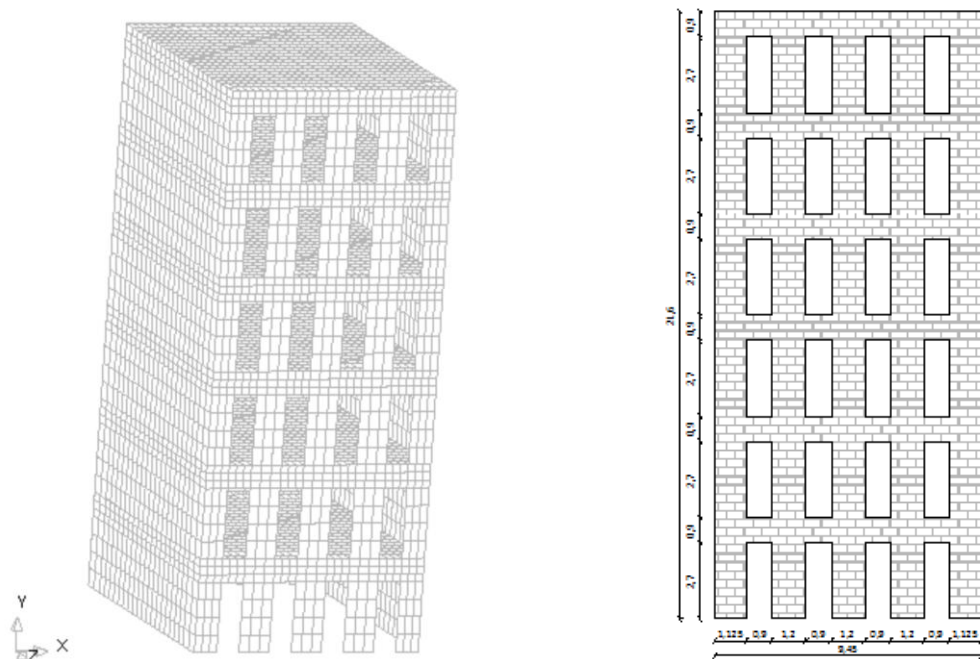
Model with 6 floors. a) Model and mesh of the walls and floors; b) Geometry.
